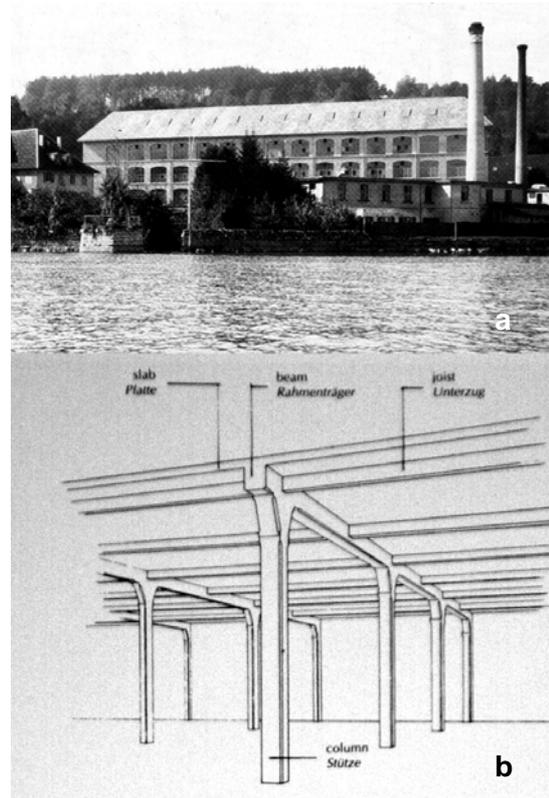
(a) View of the Pfenninger factory in Wädenswil, Maillart, 1905. (b) Maillart's floor design for the Pfenninger factory eliminates the joists and lengthens the span of the slab in comparison to Hennebique's design. (Billington¹)
